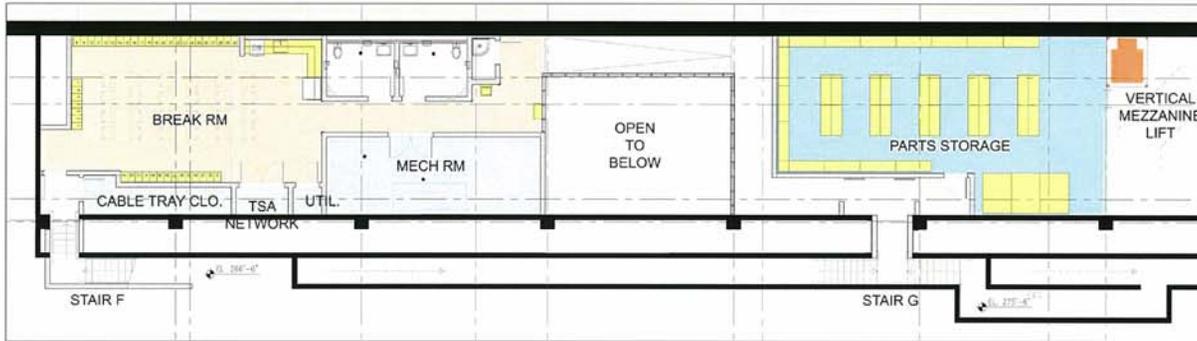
Overall Plan South Baggage Basement Steel Mezzanine Deck
